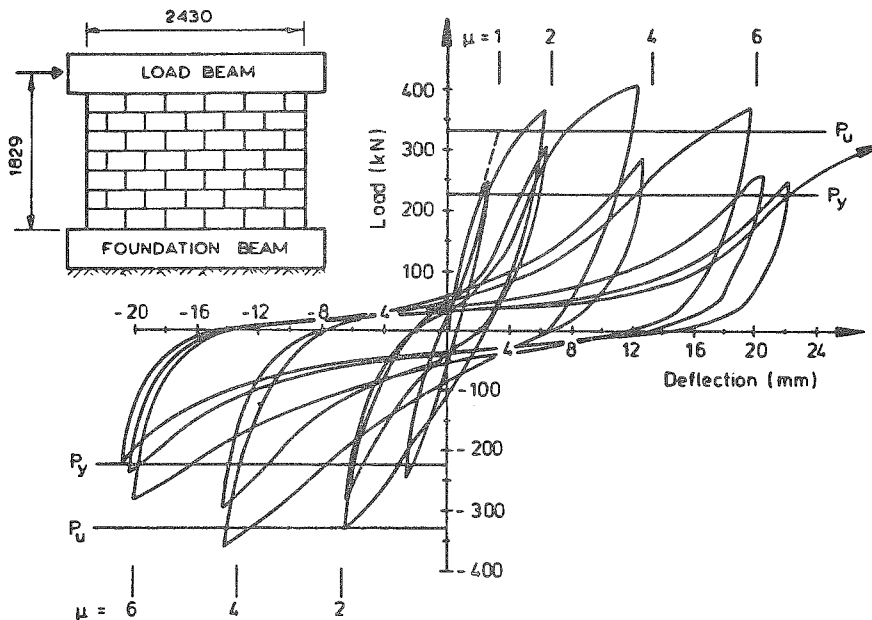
LOAD-DEFLECTION BEHAVIOUR OF A SQUAT CONCRETE MASONRY WALL
